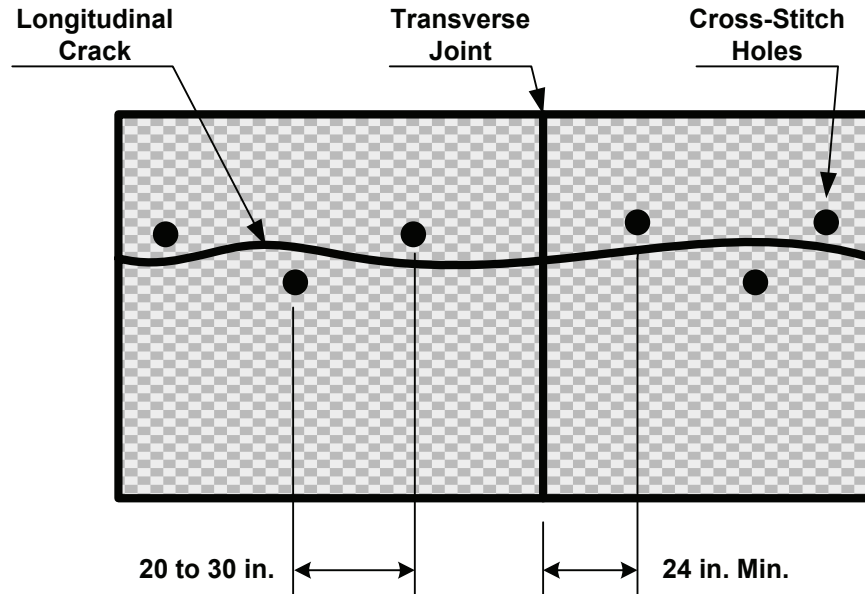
Schematic of cross-stitch tie bar installation (22)
